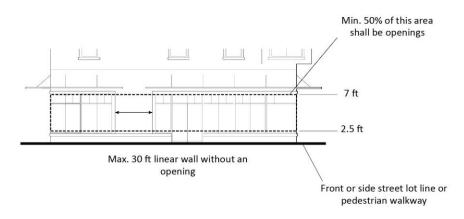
Building Transparency/Required Openings Exhibit
